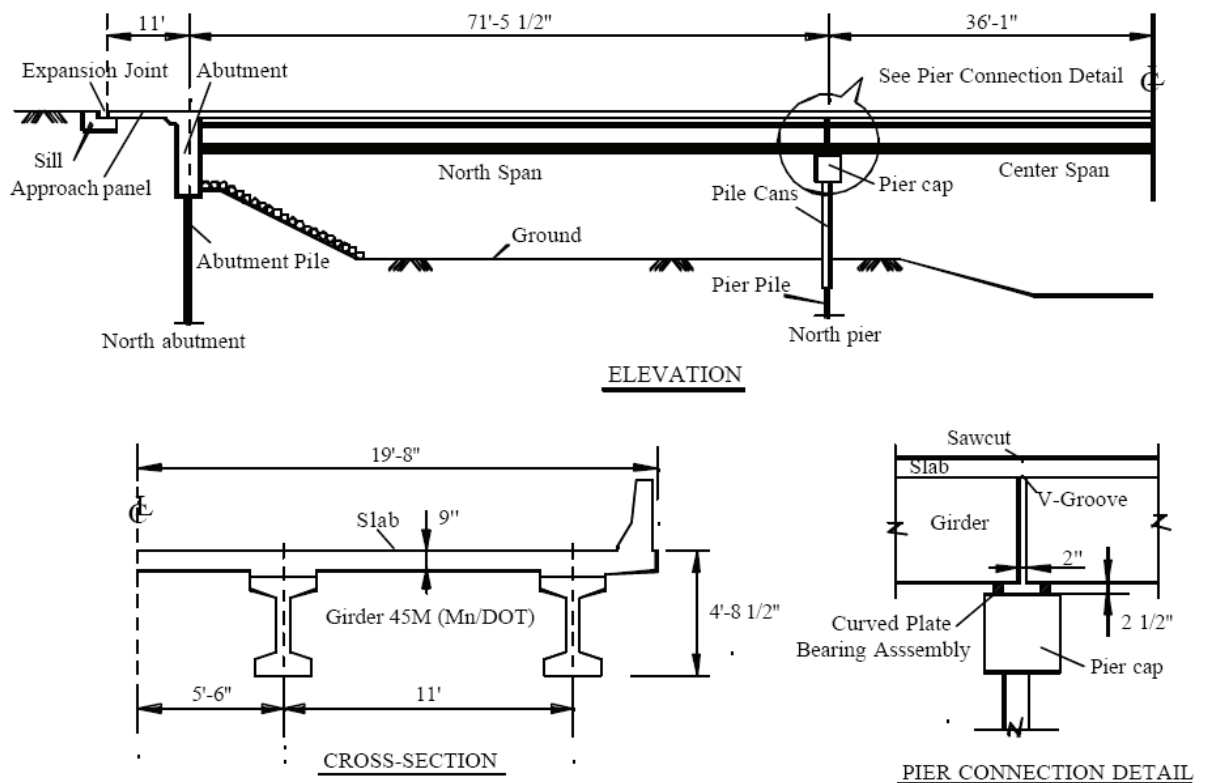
Bridge elevation and cross section. Bridge #55555 in Olmsted County, Minnesota, USA over the Zumbro River (Huang et al 2004).
